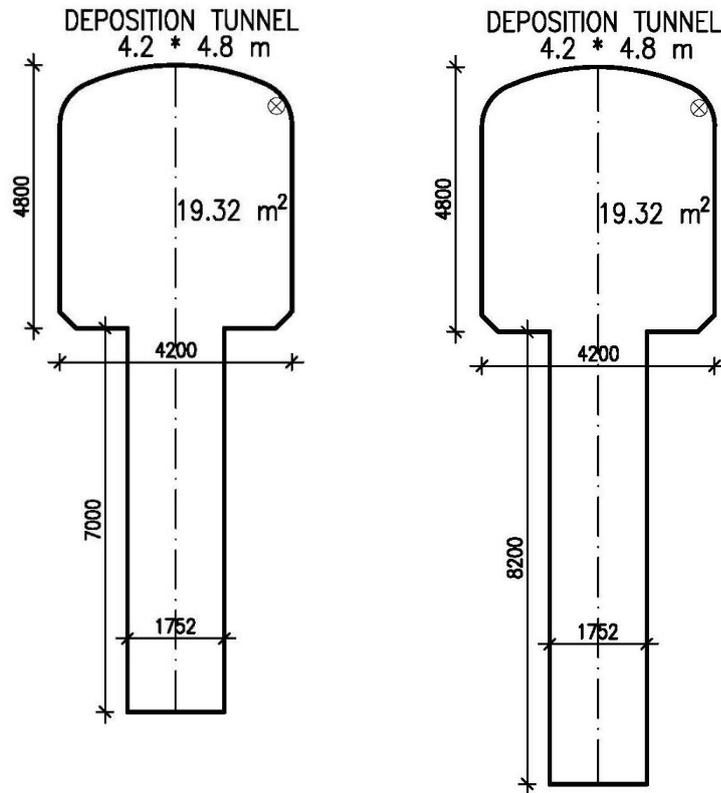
Cross-sectional view of a deposition tunnel. On the left cross-section from a deposition hole position for 3.55 m tall canister (11 pieces) and on the right for 4.75 m tall canister position (17 pieces). Figure AINS.
